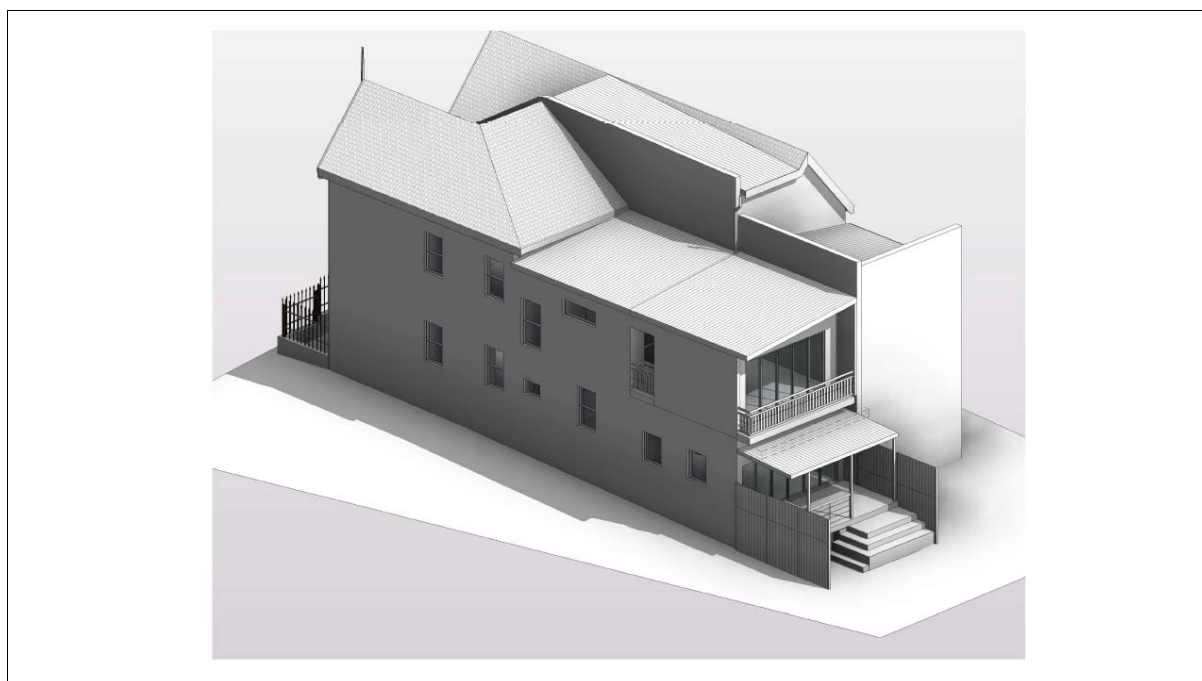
3D View prepared by Attic Group depicting a potential addition to the rear of the first floor
